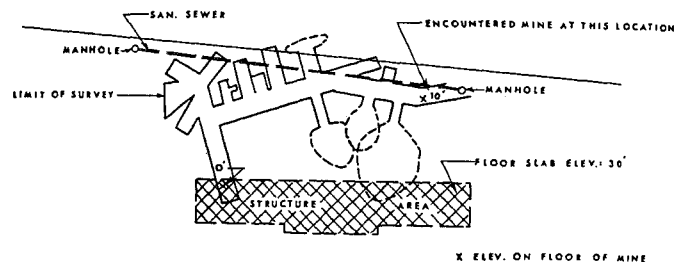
PLAN OF STRUCTURE AND SHALLOW MINE
